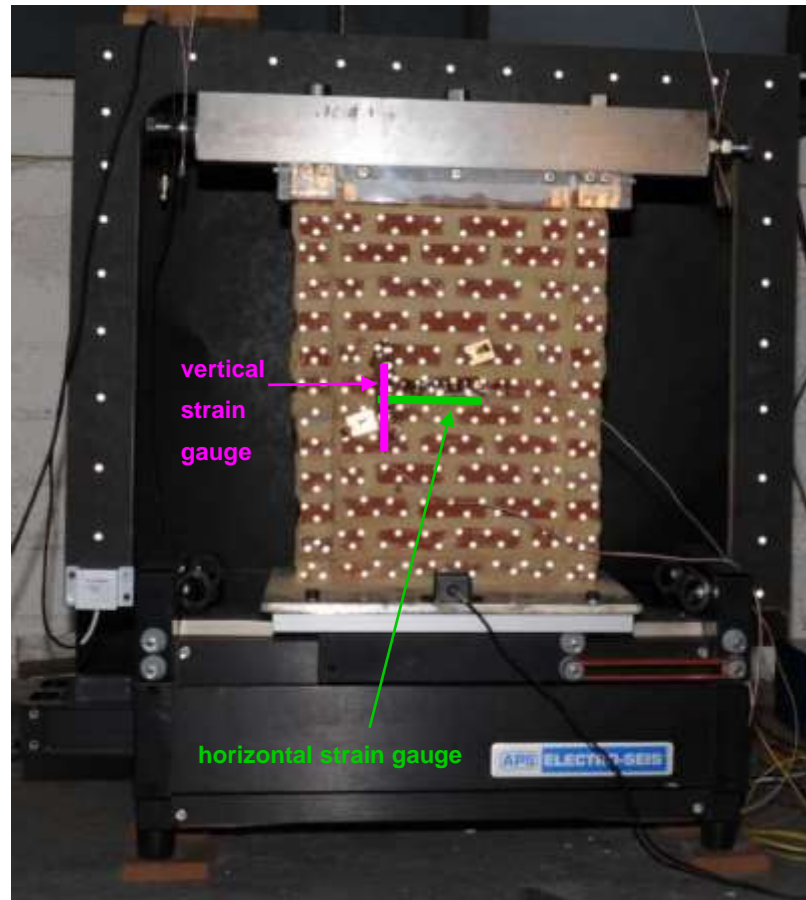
undamaged small-scale masonry specimen – exp 4
